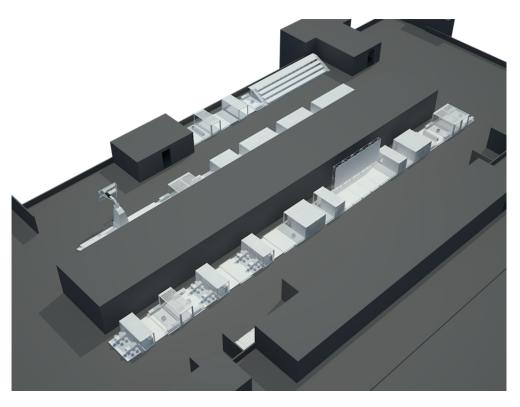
Axonometric of Lotte Mart Roof Floor
